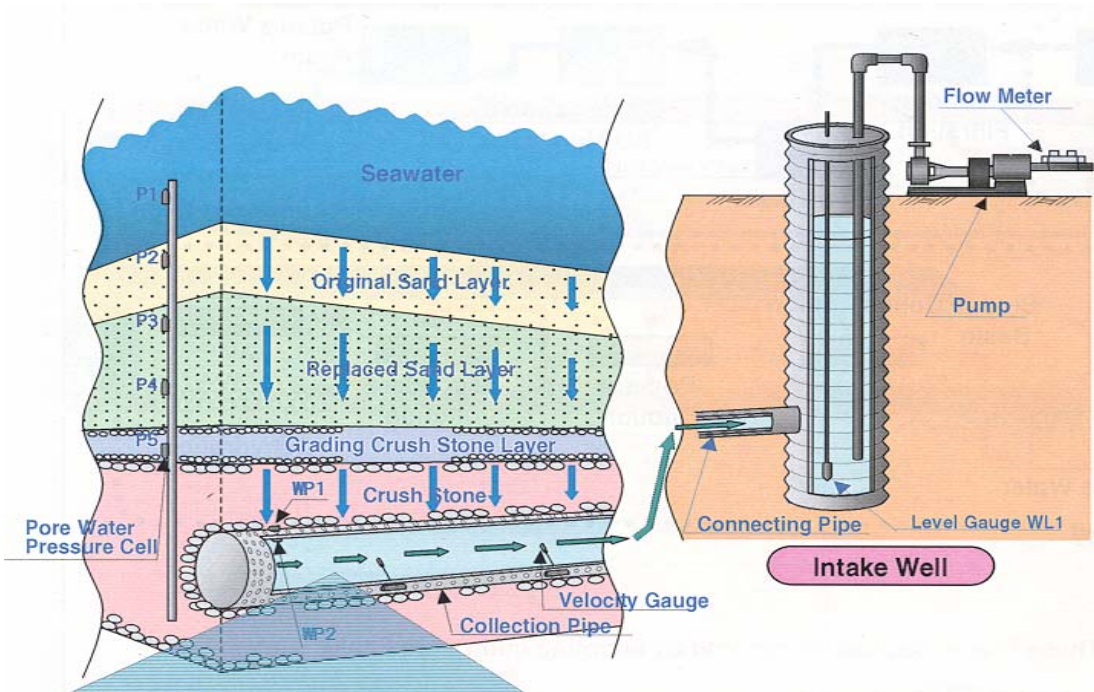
A Cross-Section of Subsurface Infiltration Gallery
